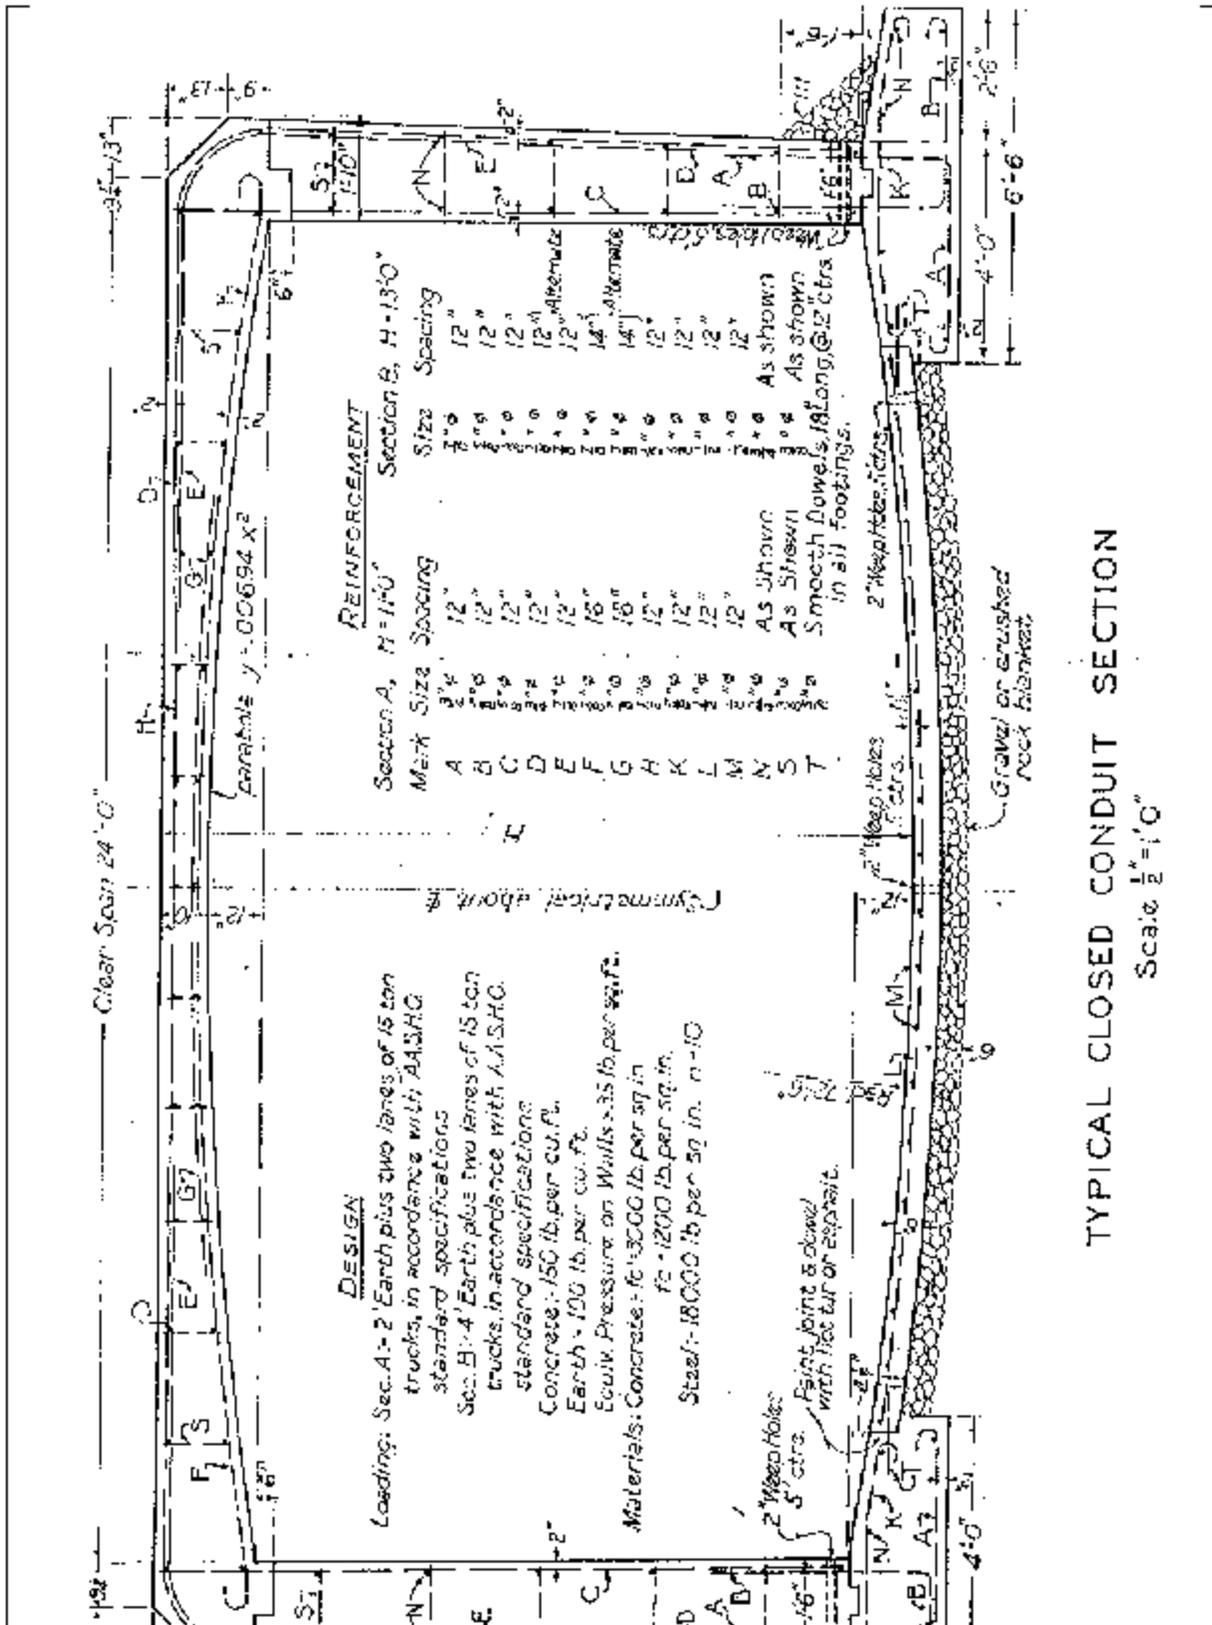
Conduit Cross-sections for Conduit "A" and Conduit "B".
